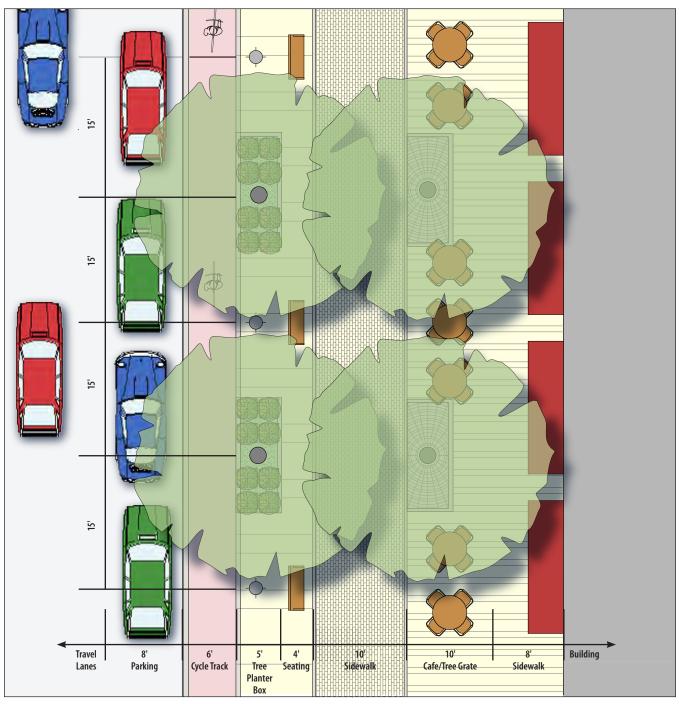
PROPOSED STREET PLAN—RHODE ISLAND AVENUE, NORTH SIDE.
